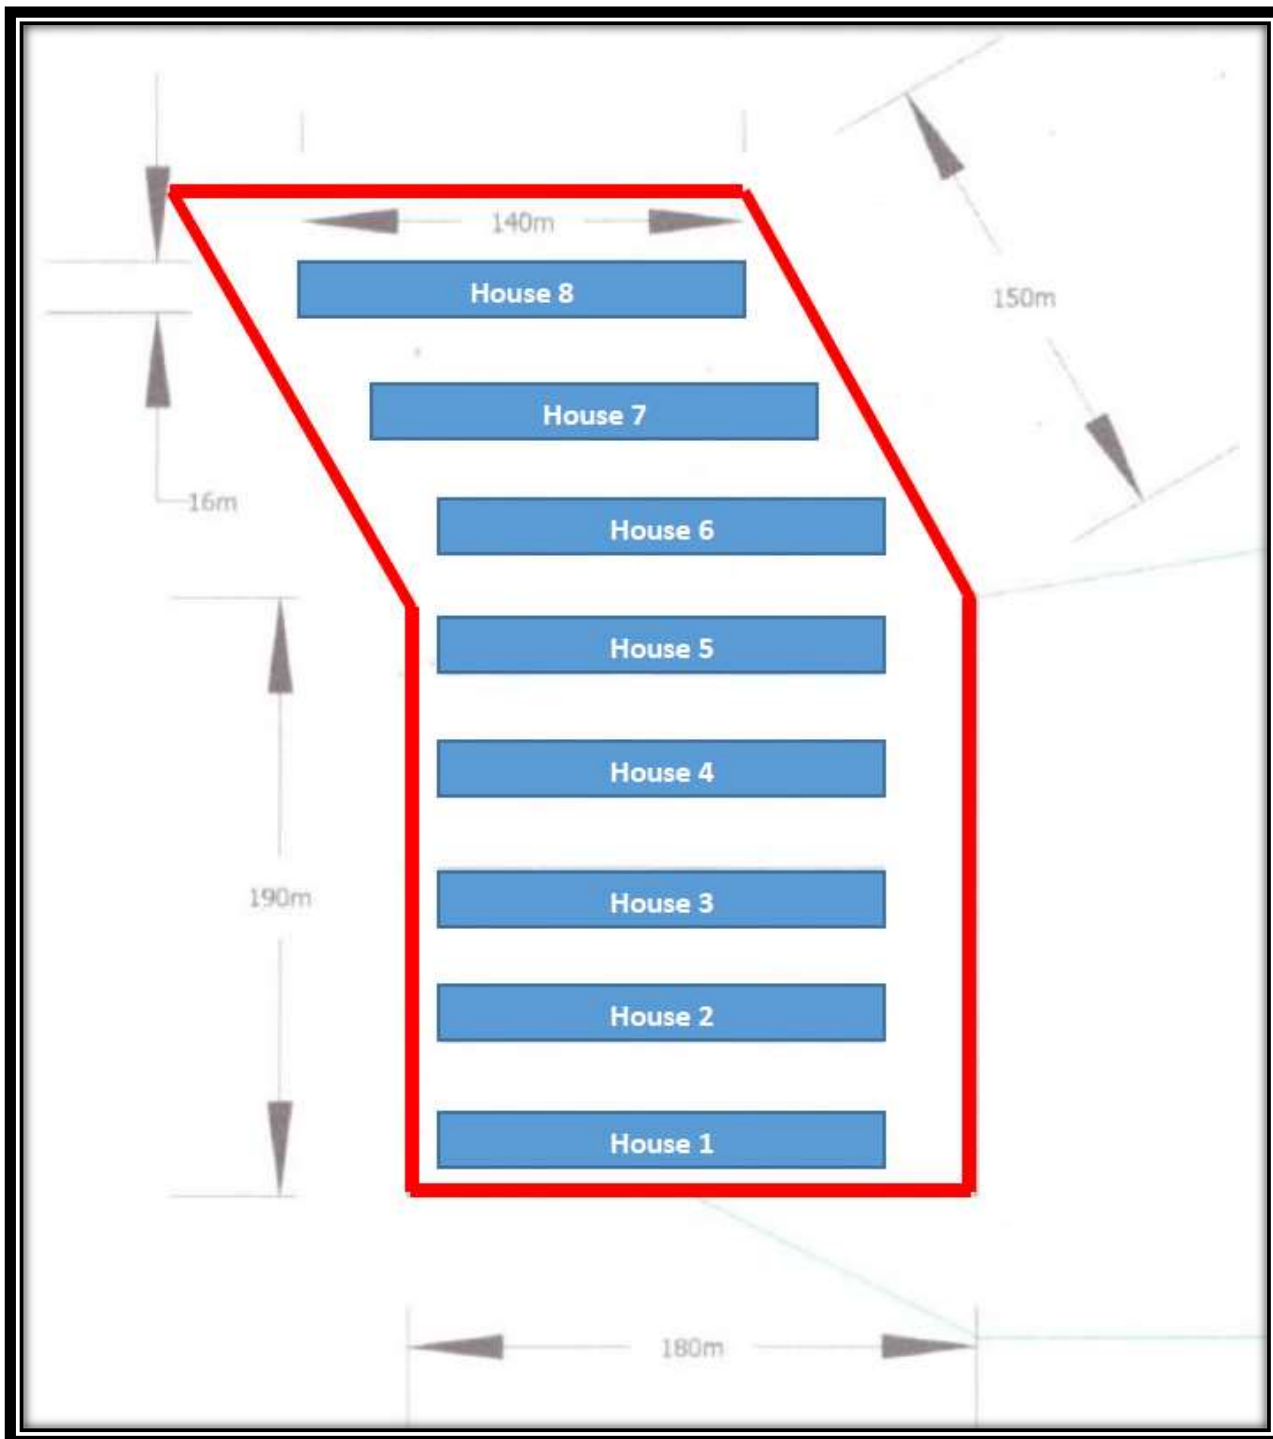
Proposed Layout plan for the eight Chicken Broiler Houses.
